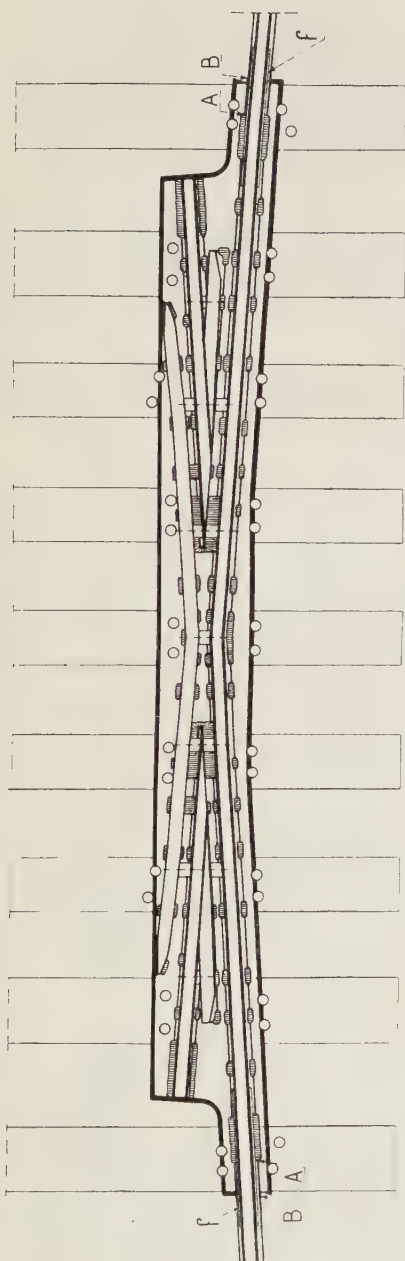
Layout of a welded obtuse crossing (French Nord Railway).
